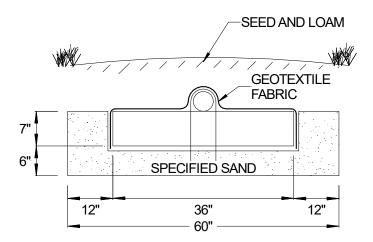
CROSS SECTION - TRENCH SYSTEM
